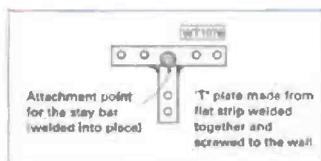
The 'T' shaped stabilising plate, is made from plates welded together, is screwed to the wall of the building.
